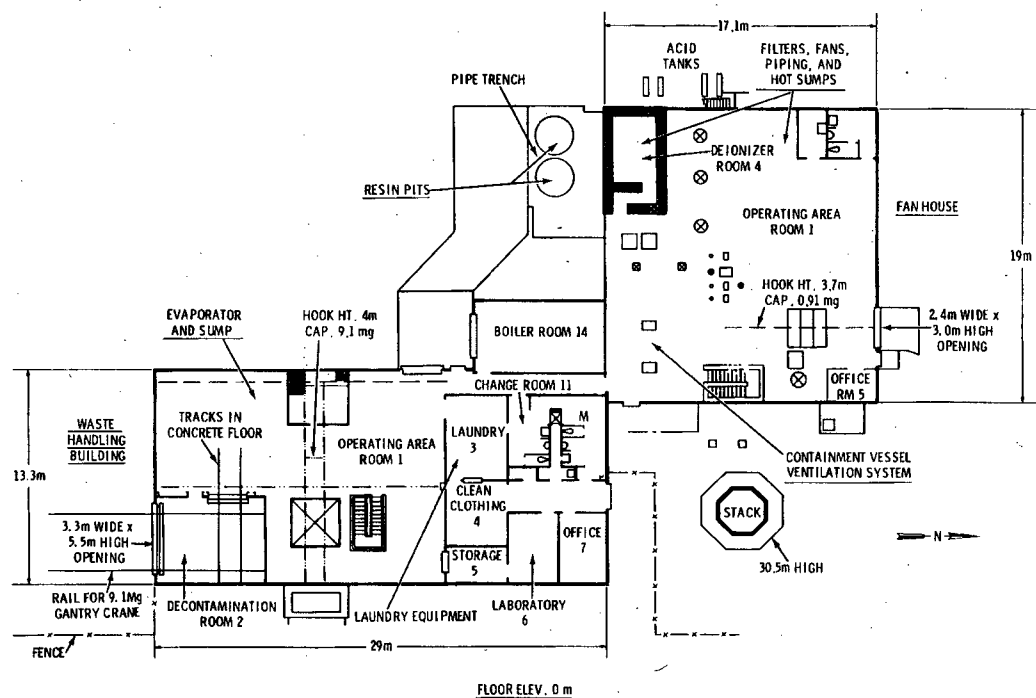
Fan House and Waste Handling Building--Plan Views
